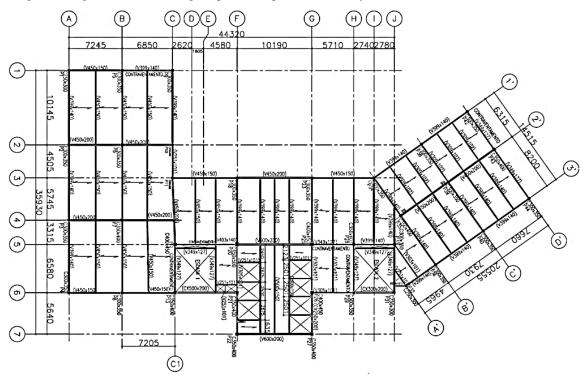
Investigated steel-concrete composite floor: 8th floor (dimensions in mm)
